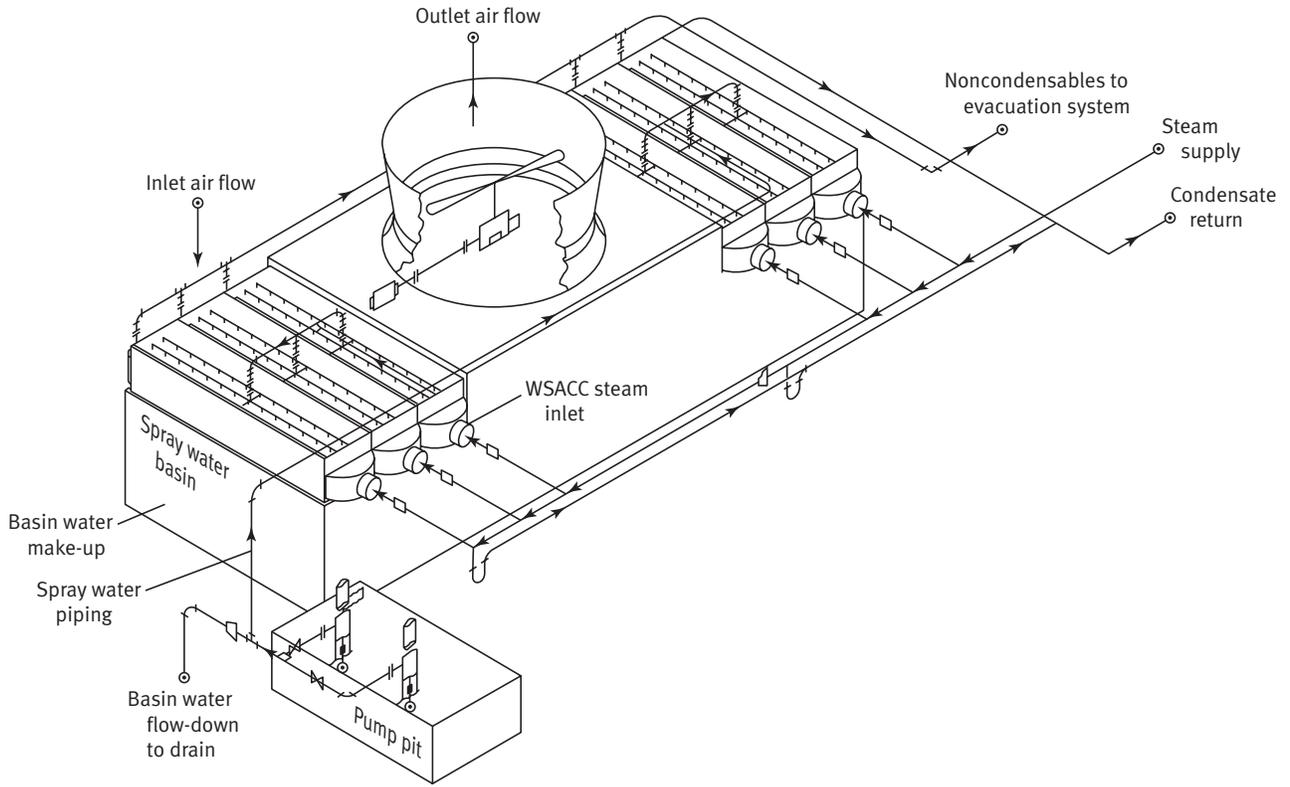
Wet Surface Air-Cooled Steam Condenser (WSACC)
